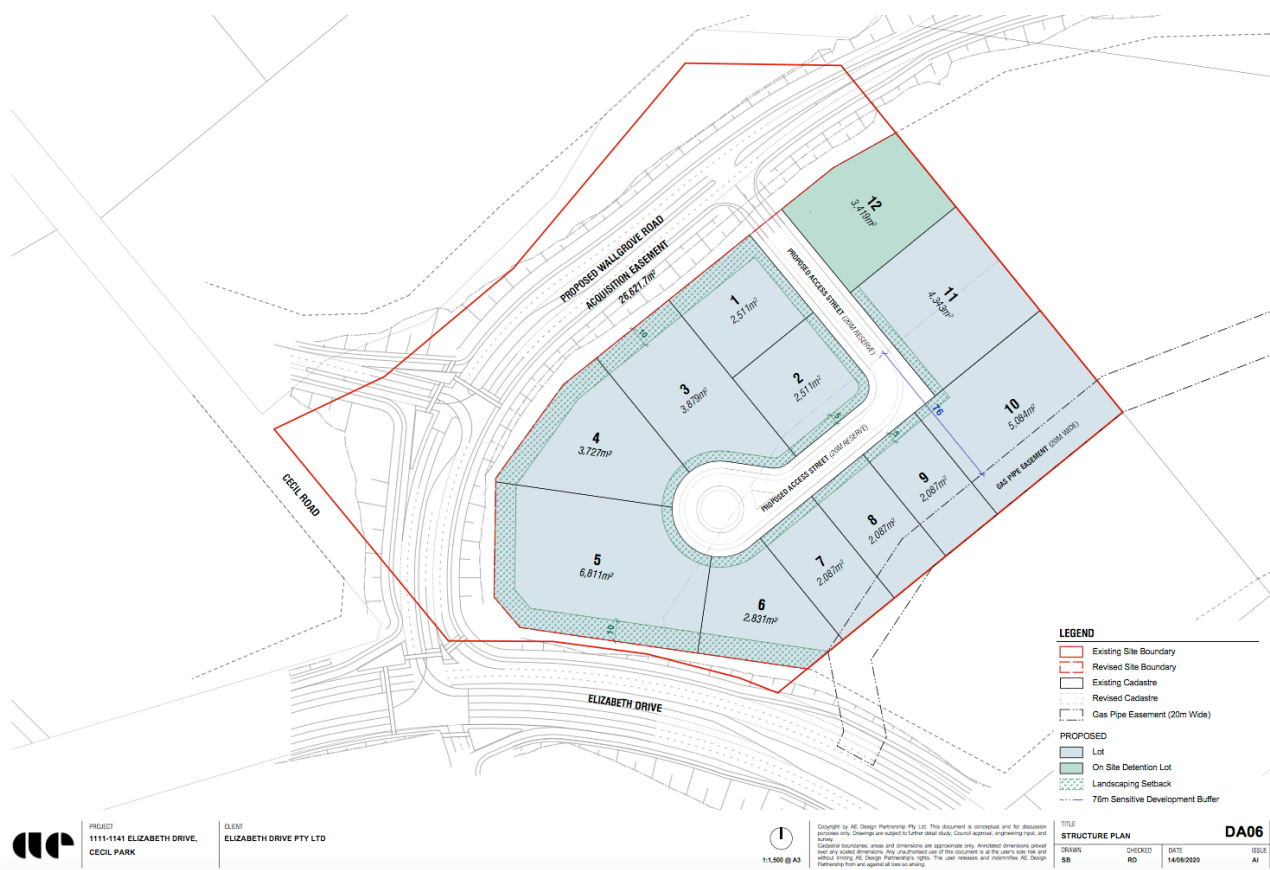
NOW PROPOSED SUBDIVISION PLAN FOR NO 1111 ELIZABETH DRIVE CECIL PARK
